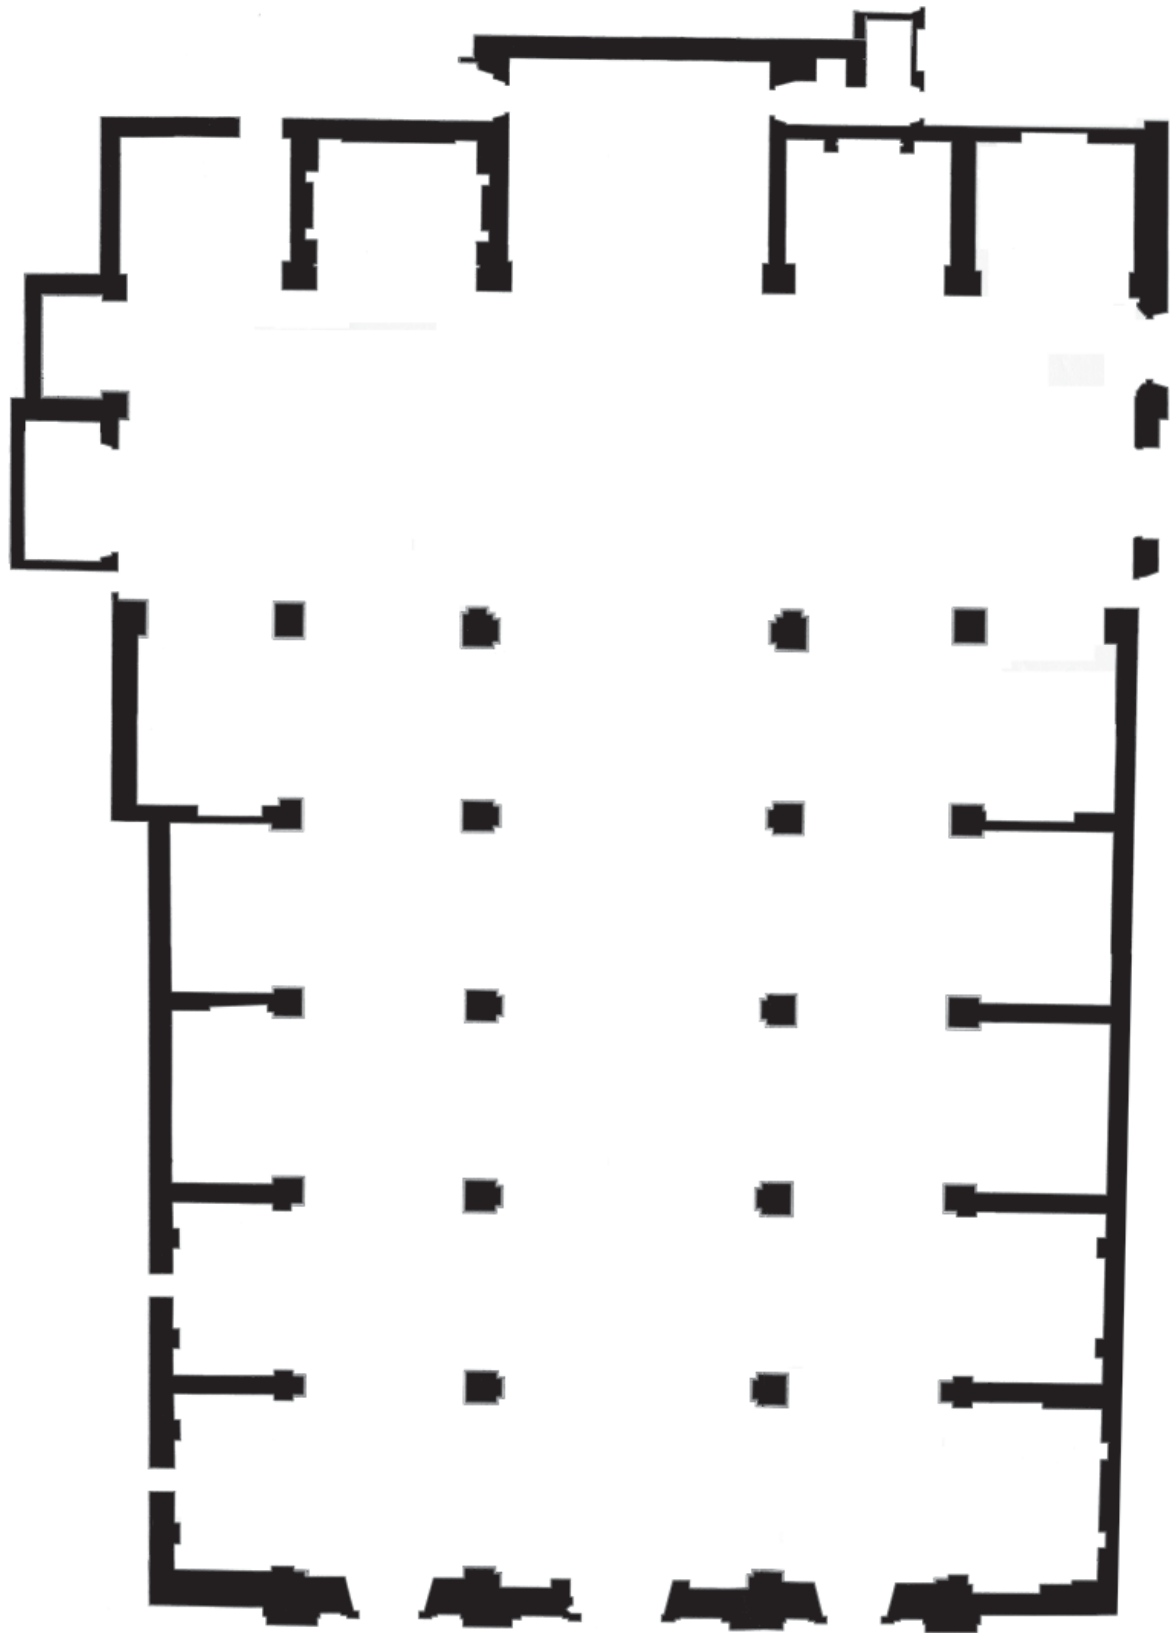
Basilica of Santa Trinita, Florence, floor plan (author).
